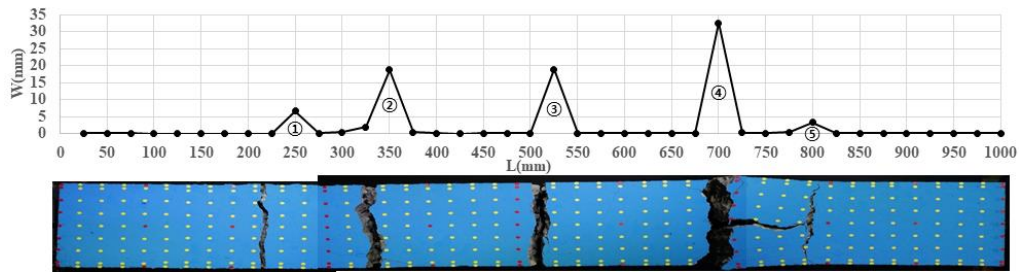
Crack pattern and crack width (Steel ratio 2.87%)
